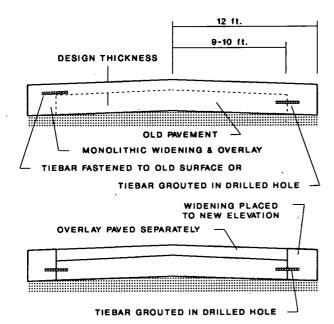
A pavement can be widened while paving a bonded concrete overlay or paved separately (9).
